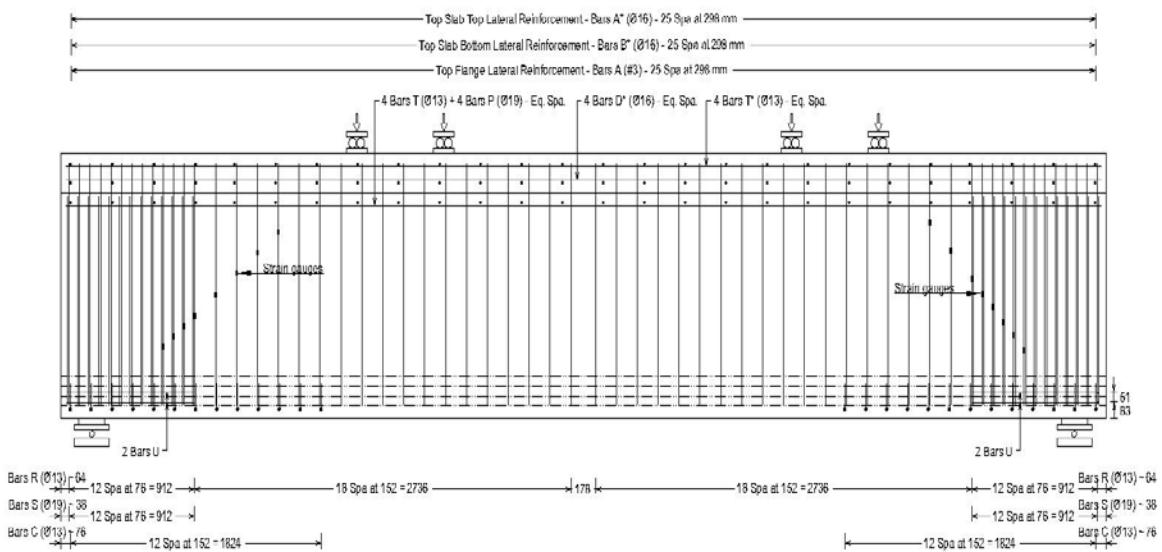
Concrete Dimensions and Reinforcement Details for Girder D1 (Labib 2012)
